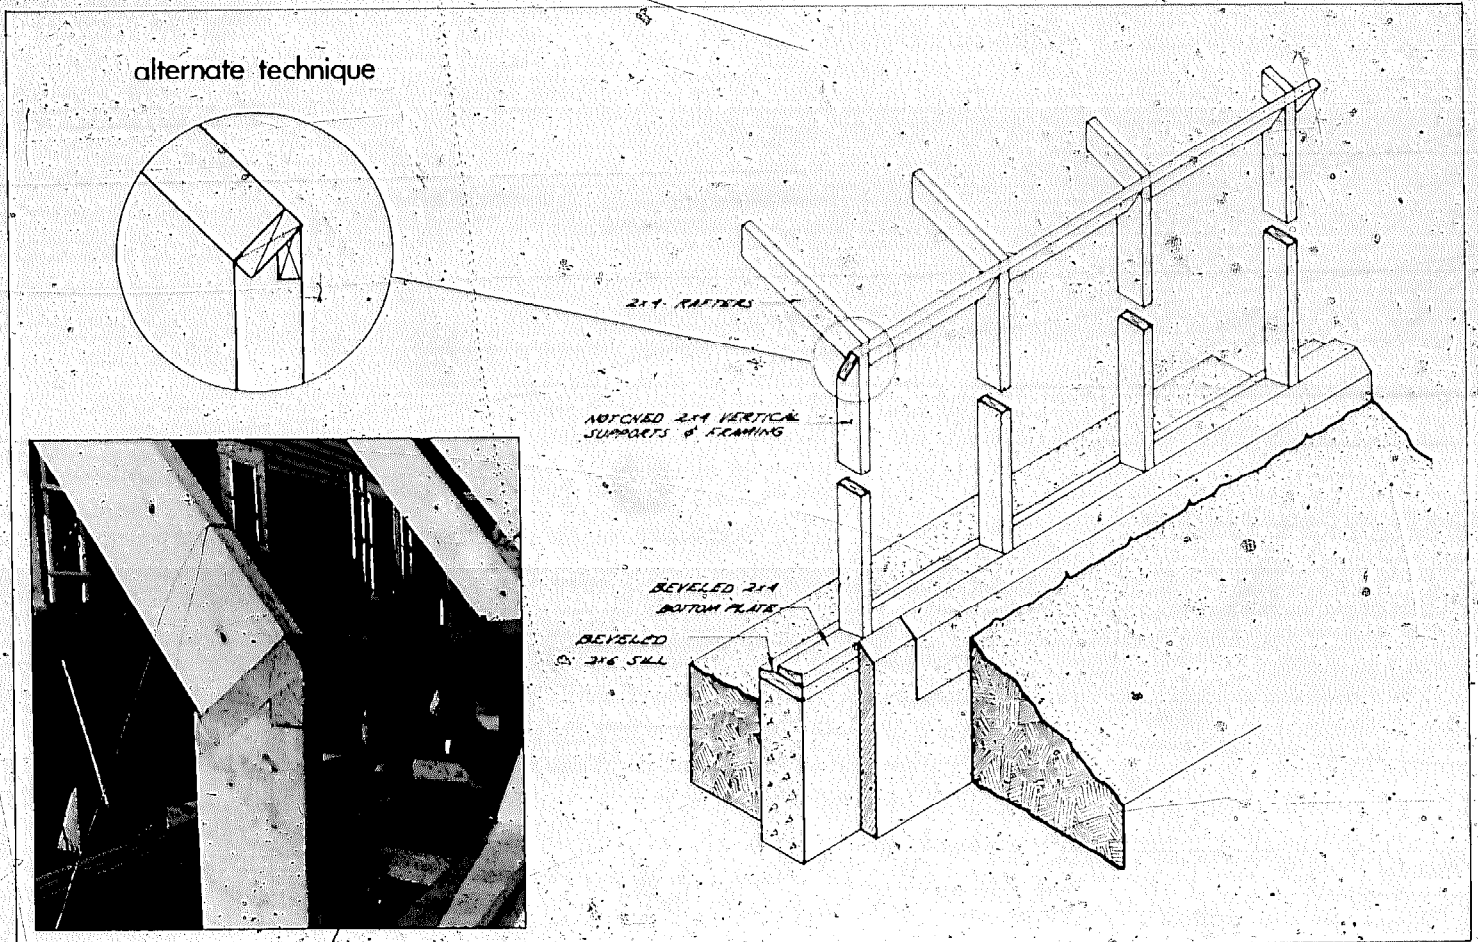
Notched structural kneewall shown with concrete foundation
